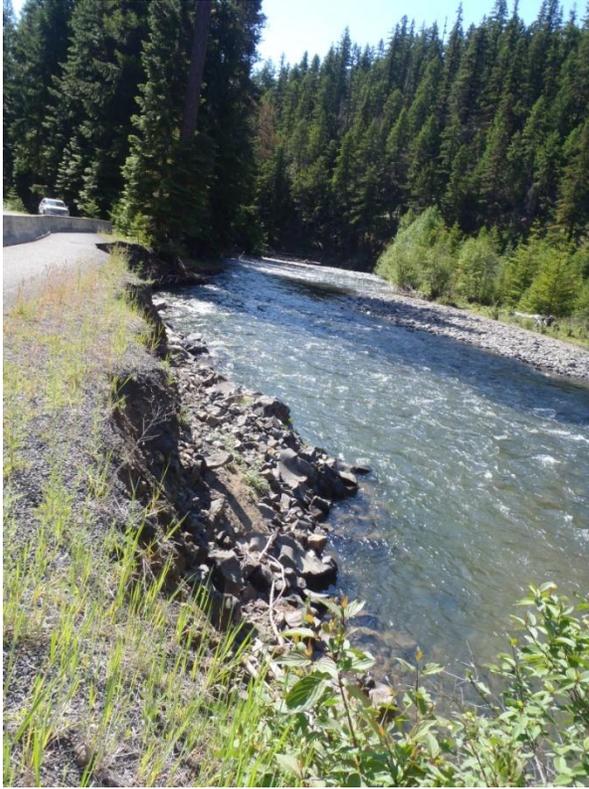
Damaged road shoulder at mile post 5.1, facing downstream
